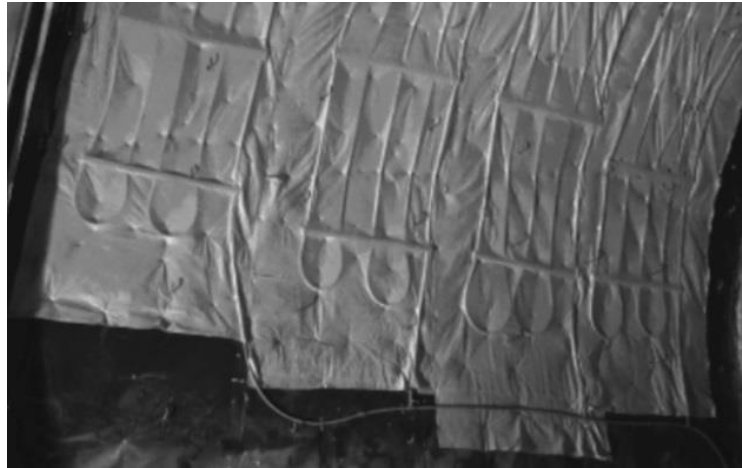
Example of an energy geotextile with the prefabricated sections and the collector pipe at the bottom. From Adam and Markiewicz (2009)
